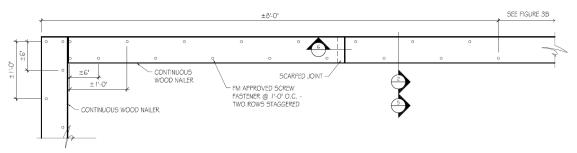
A - WOOD BLOCKING CORNER ANCHORAGE 8'-0" FROM CORNER
